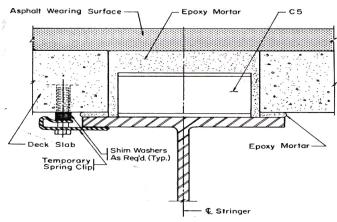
Welded channel section detail used in the New York Thruway Experimental Bridge
